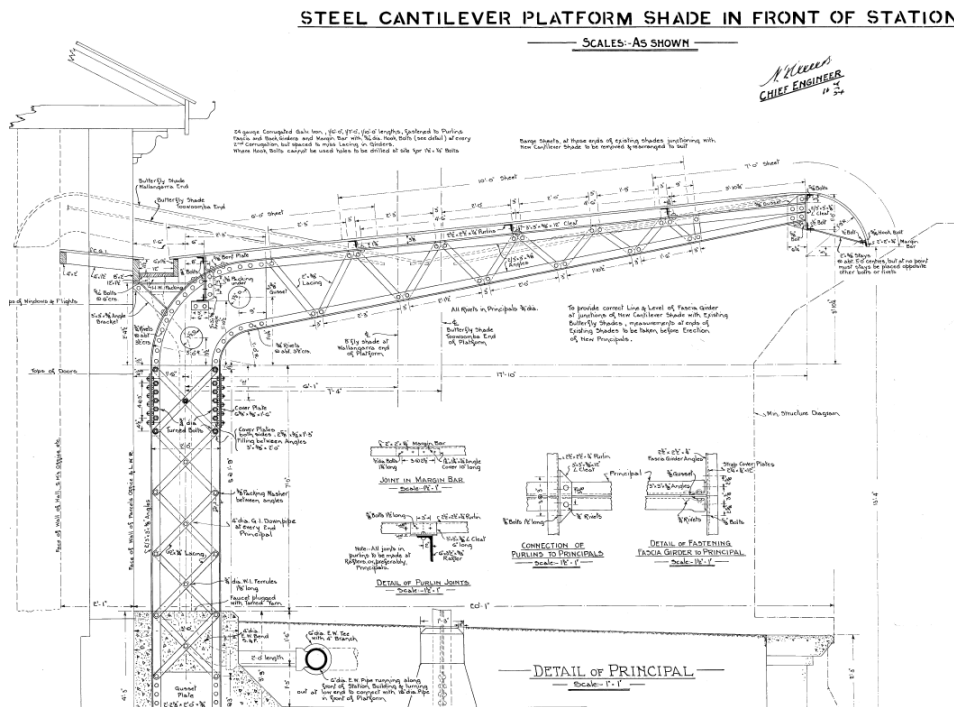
New cantilever platform awning to station. Drawing dated 1934. Source: QLD Rail archive drawing no. L02377.
